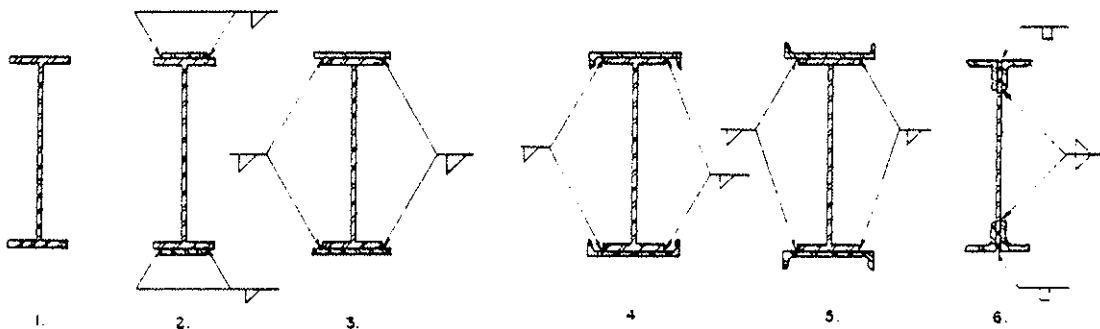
Examples of Welded Built-up Tension Members Utilizing Rolled Shapes
